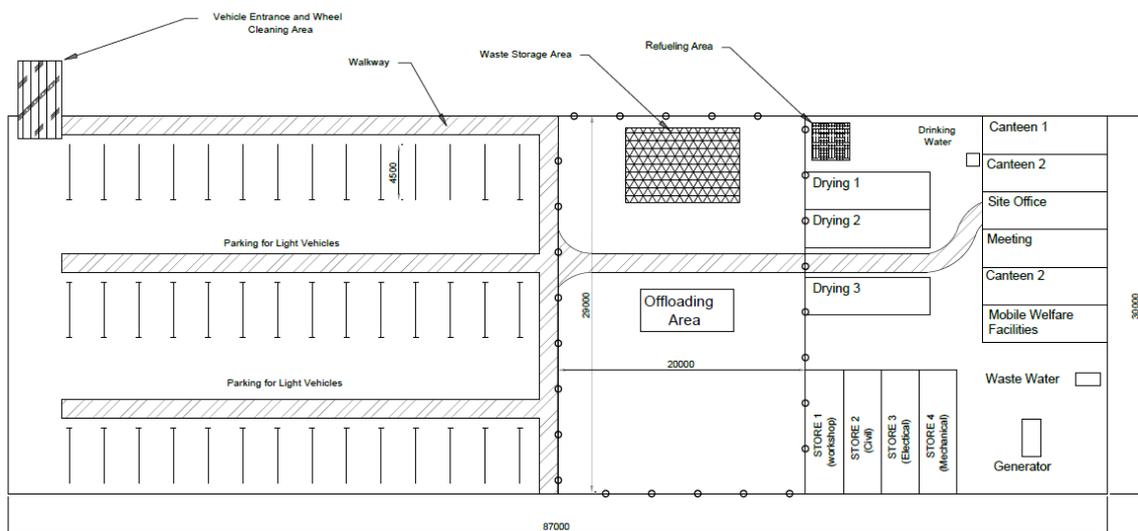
Indicative Typical Site Compound Layout (refer to drawing SD-DR-07)
